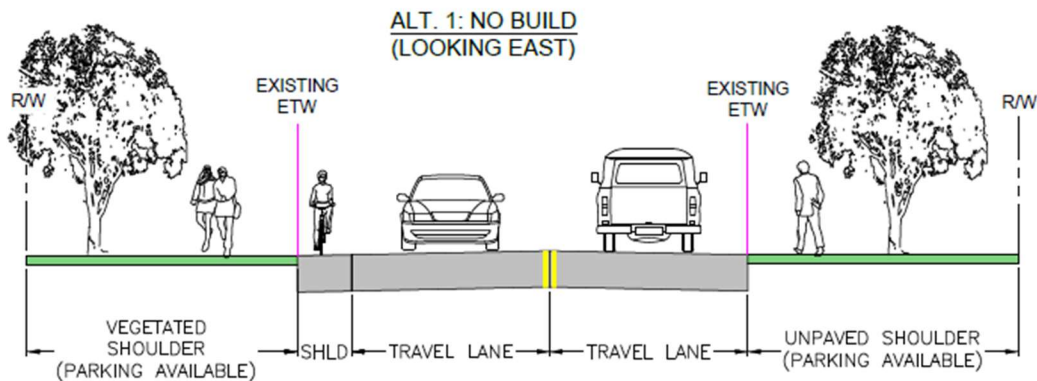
Coleman Avenue (Menlo Oaks) Alternative 1
